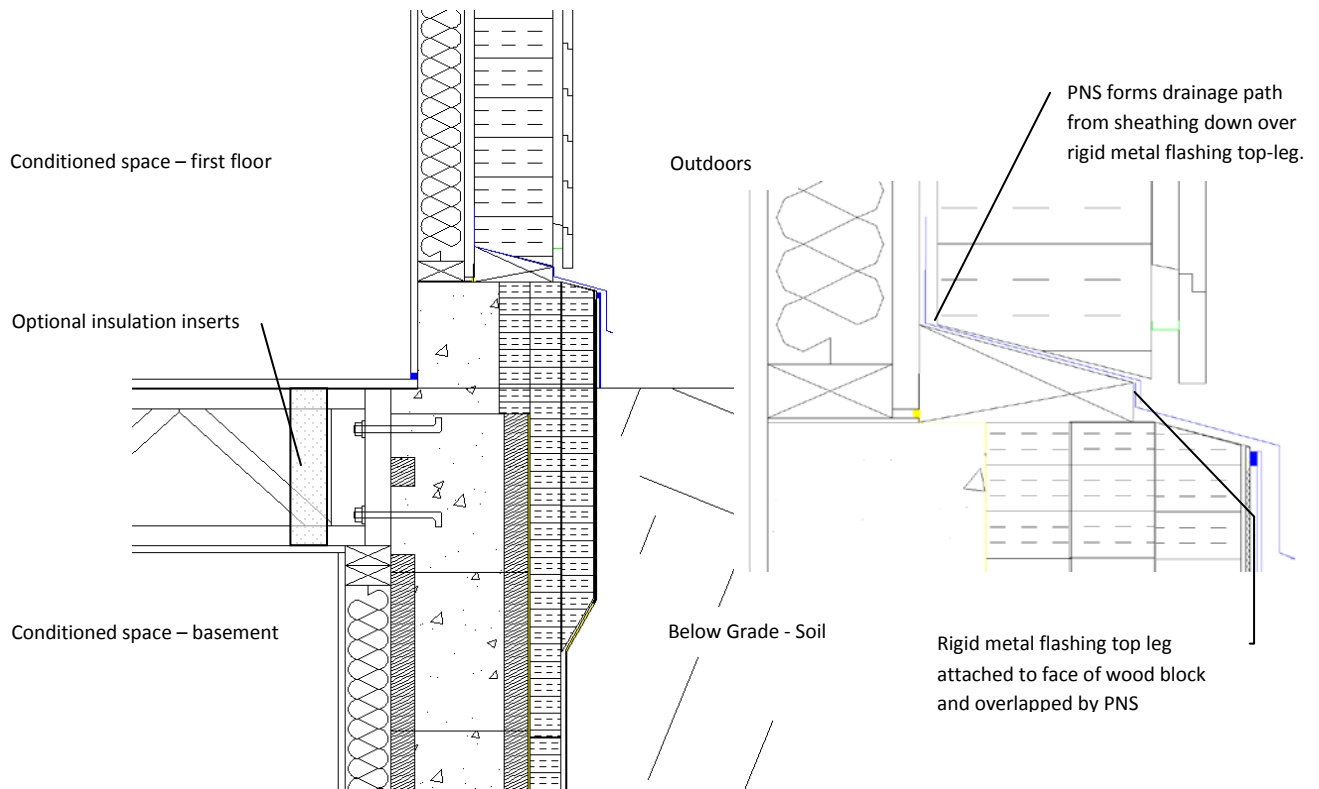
Conditioned Space to Outdoors - First storey floor detail.
